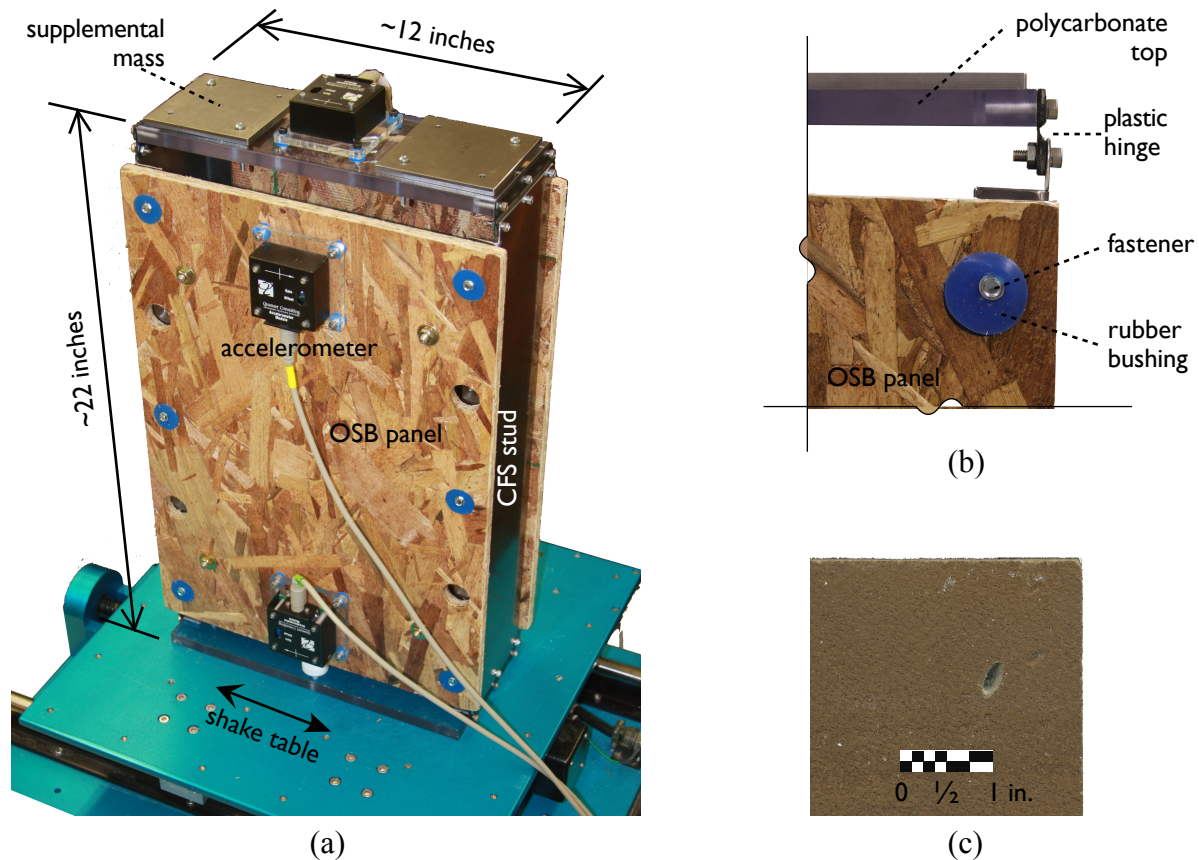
(a) Shake table model with OSB panels. (b) Detail of fastener and rubber bushing in displaced position. (c) Detail of damage to fiberboard sheathing created by fastener motion.
